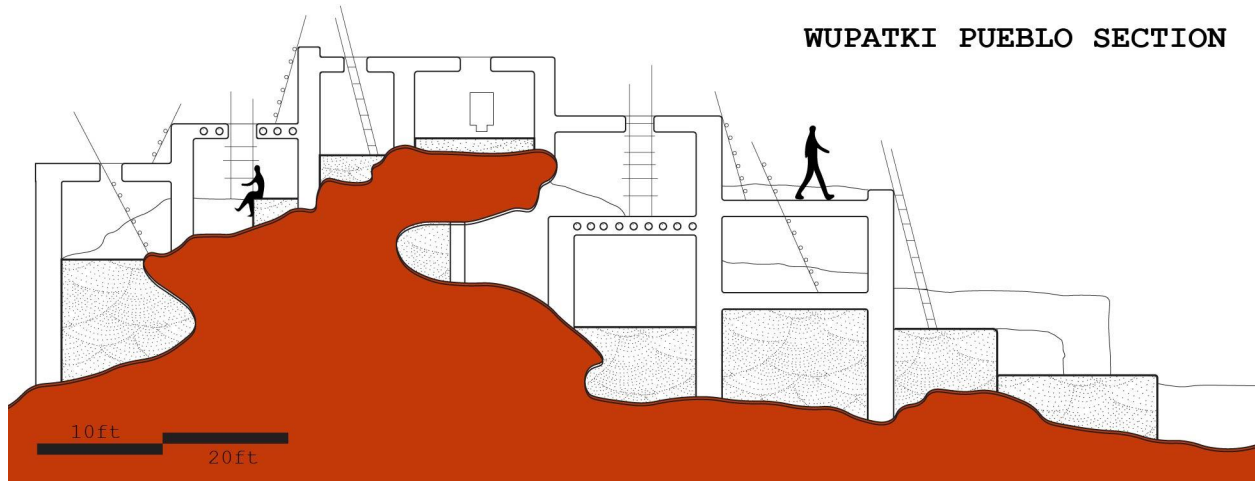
Ancestral Puebloans, (drawing: Tunnell) section showing roof circulation, boulder adaptation, & thick masonry walls, Wupatki Pueblo, Flagstaff, AZ, 1106-1225.
